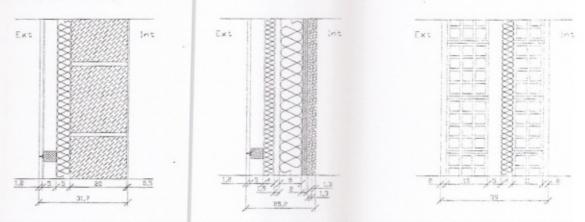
(a) Mixed-weight double leaf wall PMD2.1/15 - wood/cement board, air gap, cork insulation, ac (b) Triple lightweight wall PT(L)3.1 - wood/cement board, air gap, cork insulation, sandwich panel; (c) Heavyweight double leaf wall PD1.2/15 - Hollow brick and XPS Insulation on the air-gap
